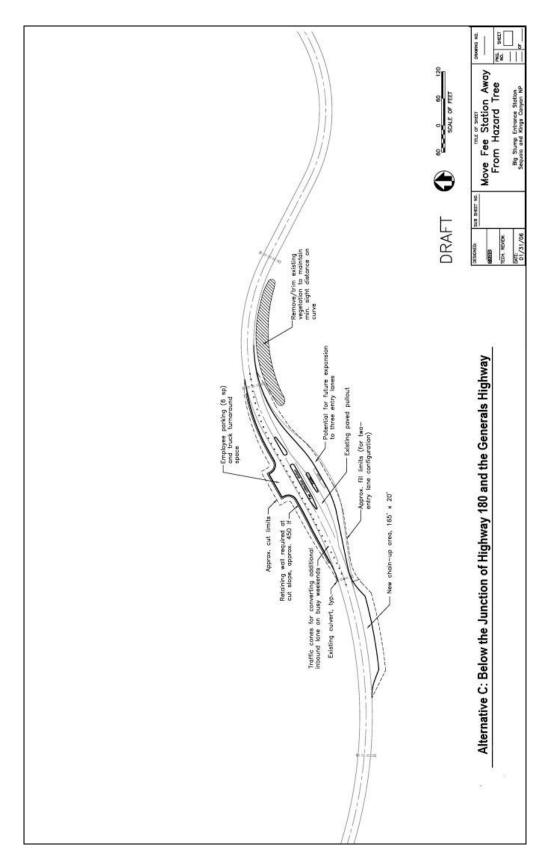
Alternative C: Preliminary Design, Big Stump Entrance Station
